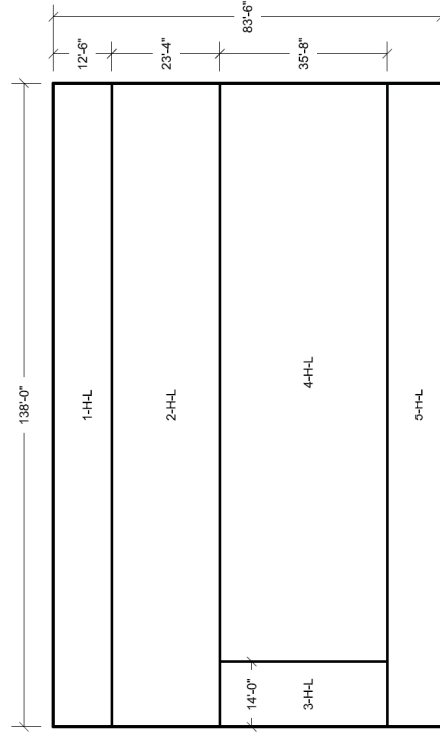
H.6-98: UHS BASIN WEST WALL LOOKING EAST
